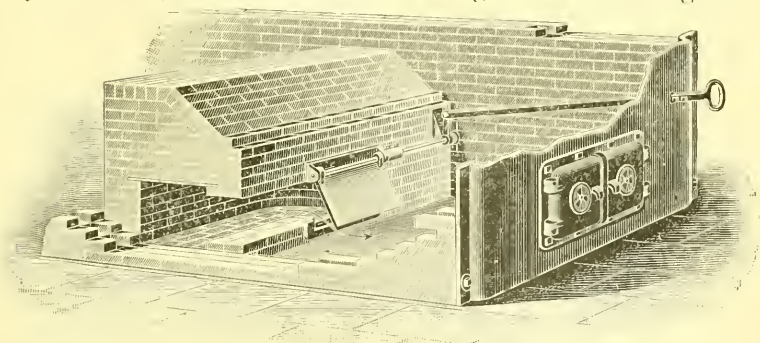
ASHPIT DAMPER IN BRIDGE WALL.
